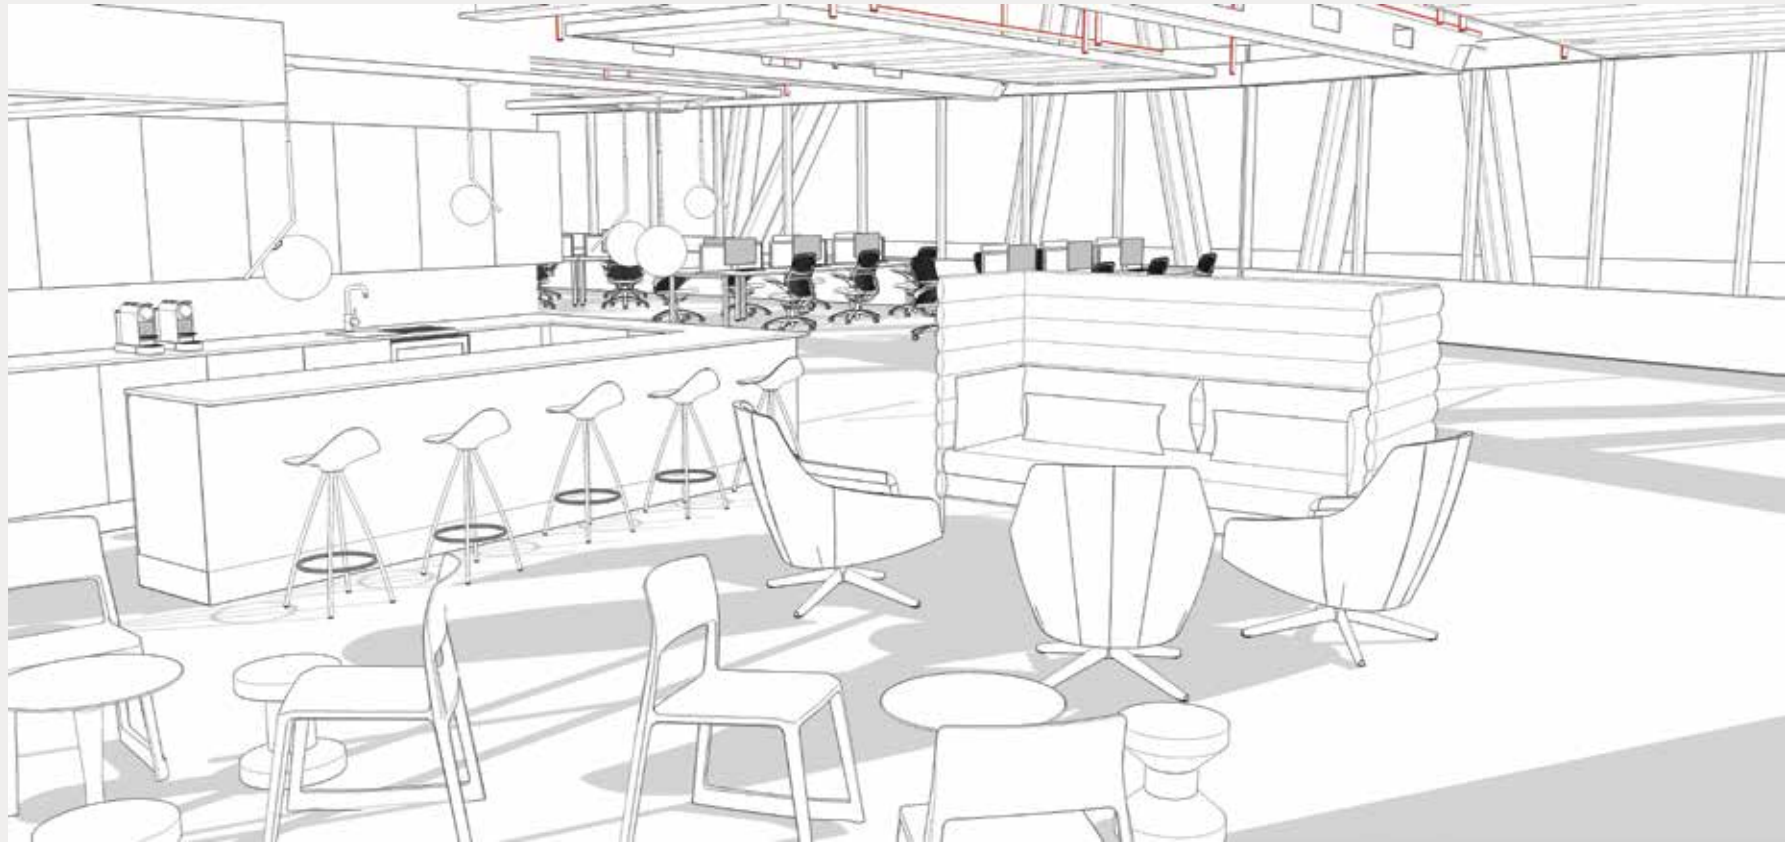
| Indicative Sketch of Third Floor Reception
